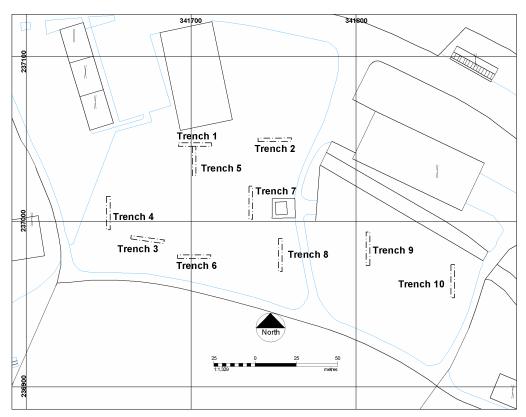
Location plan of the evaluation trenches and the layout of the proposed buildings
